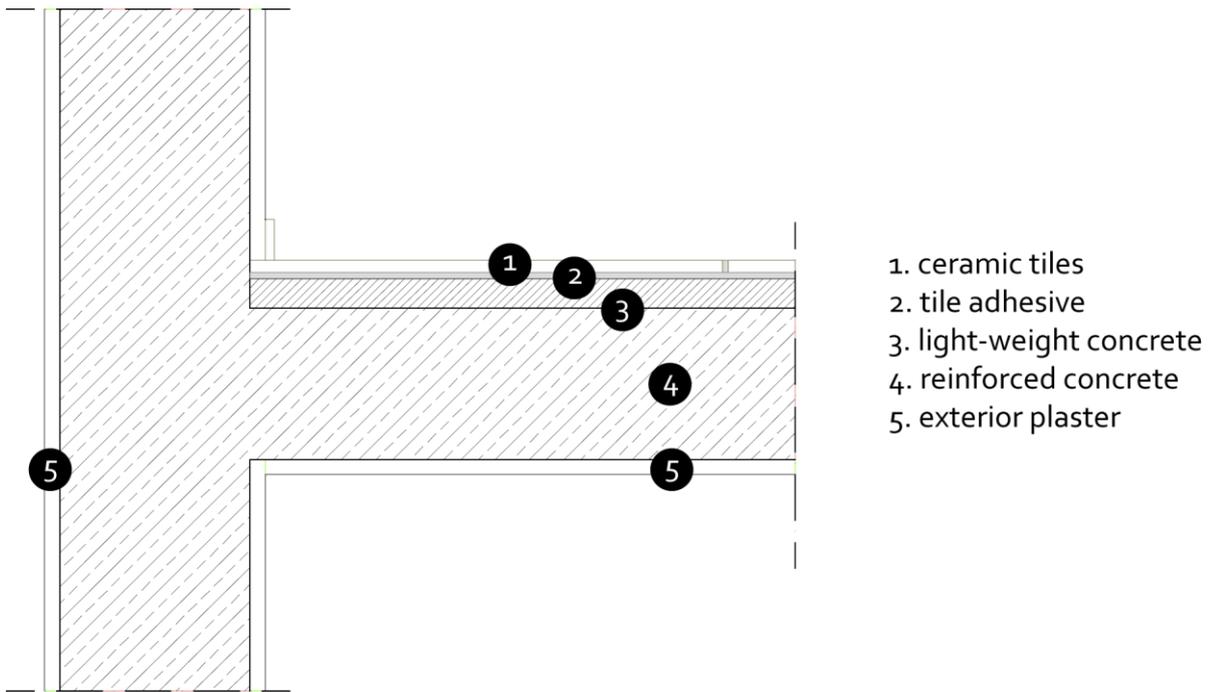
Common practice Pilotis - Buildings like MF₂, MF₃ (161)
